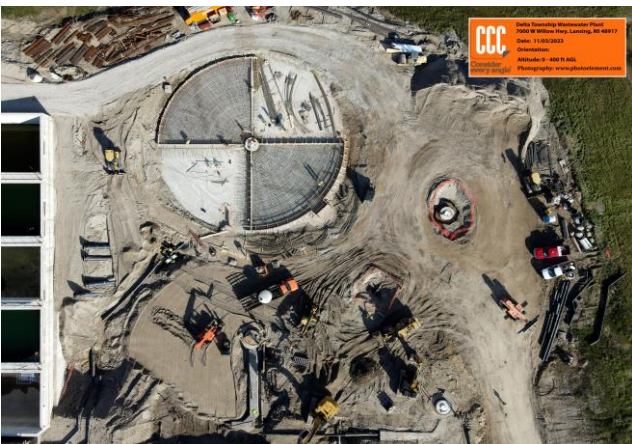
Final Clarifier 12" Drain Piping and Manhole
